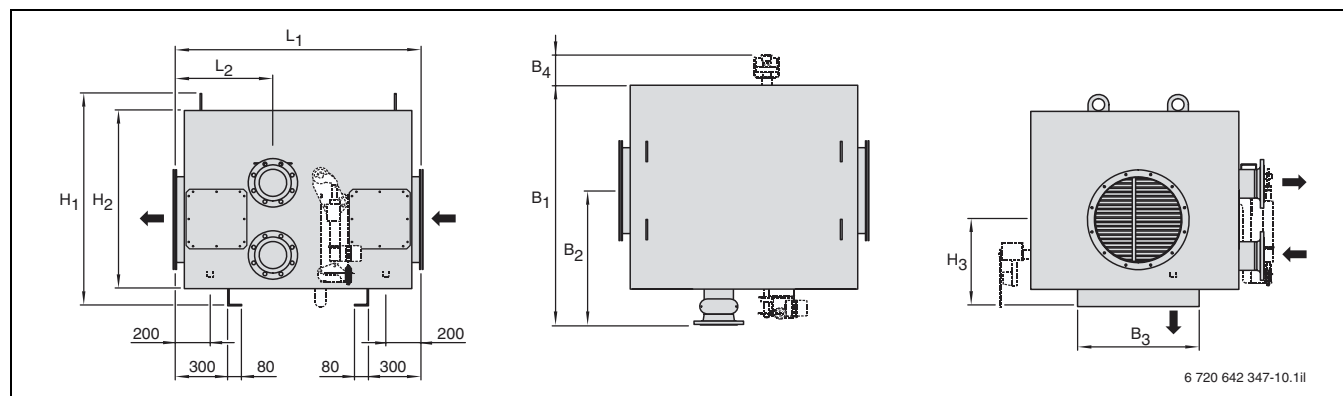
Dimensions flue gas heat exchanger ECO 6 SA (dim. in mm)
